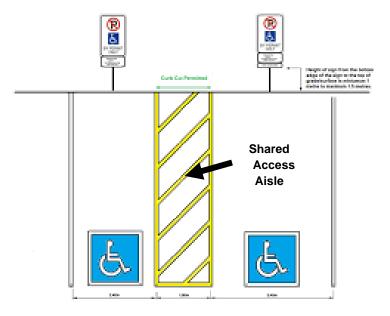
Barrier- Free Parking Space Dimensions – shared access aisle
